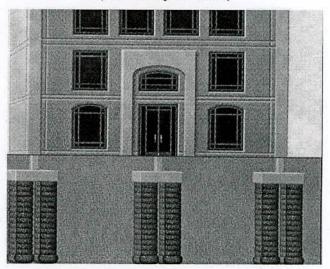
(b) Rammed Aggregate Pier installation below structure's foundation (After Geopier 2005a)
